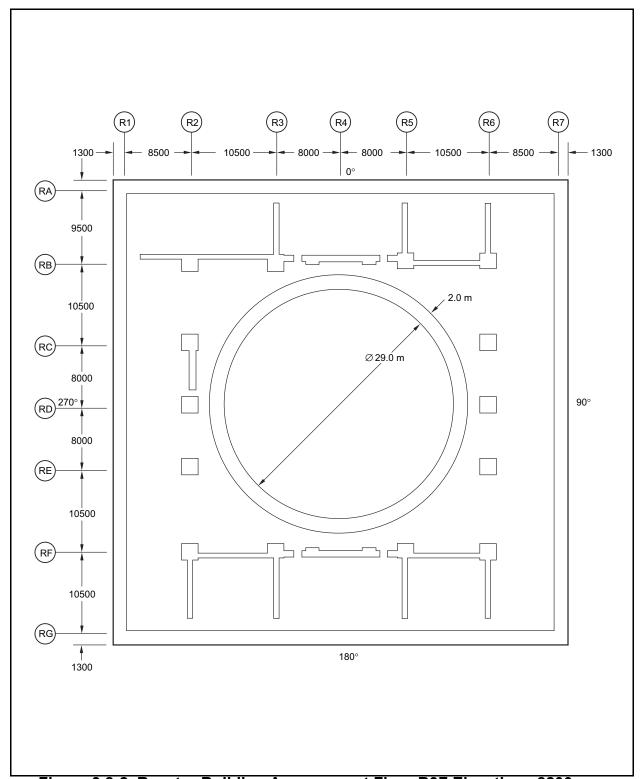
Reactor Building Arrangement Floor B3F Elevation –8200 mm
